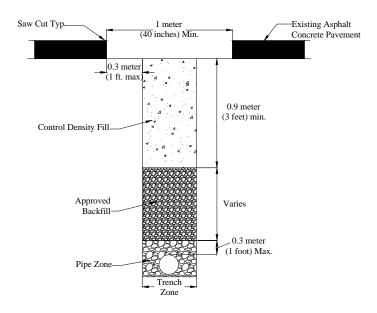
Typical trench from WSDOT cross section using cdf as backfill material (WSDOT)
